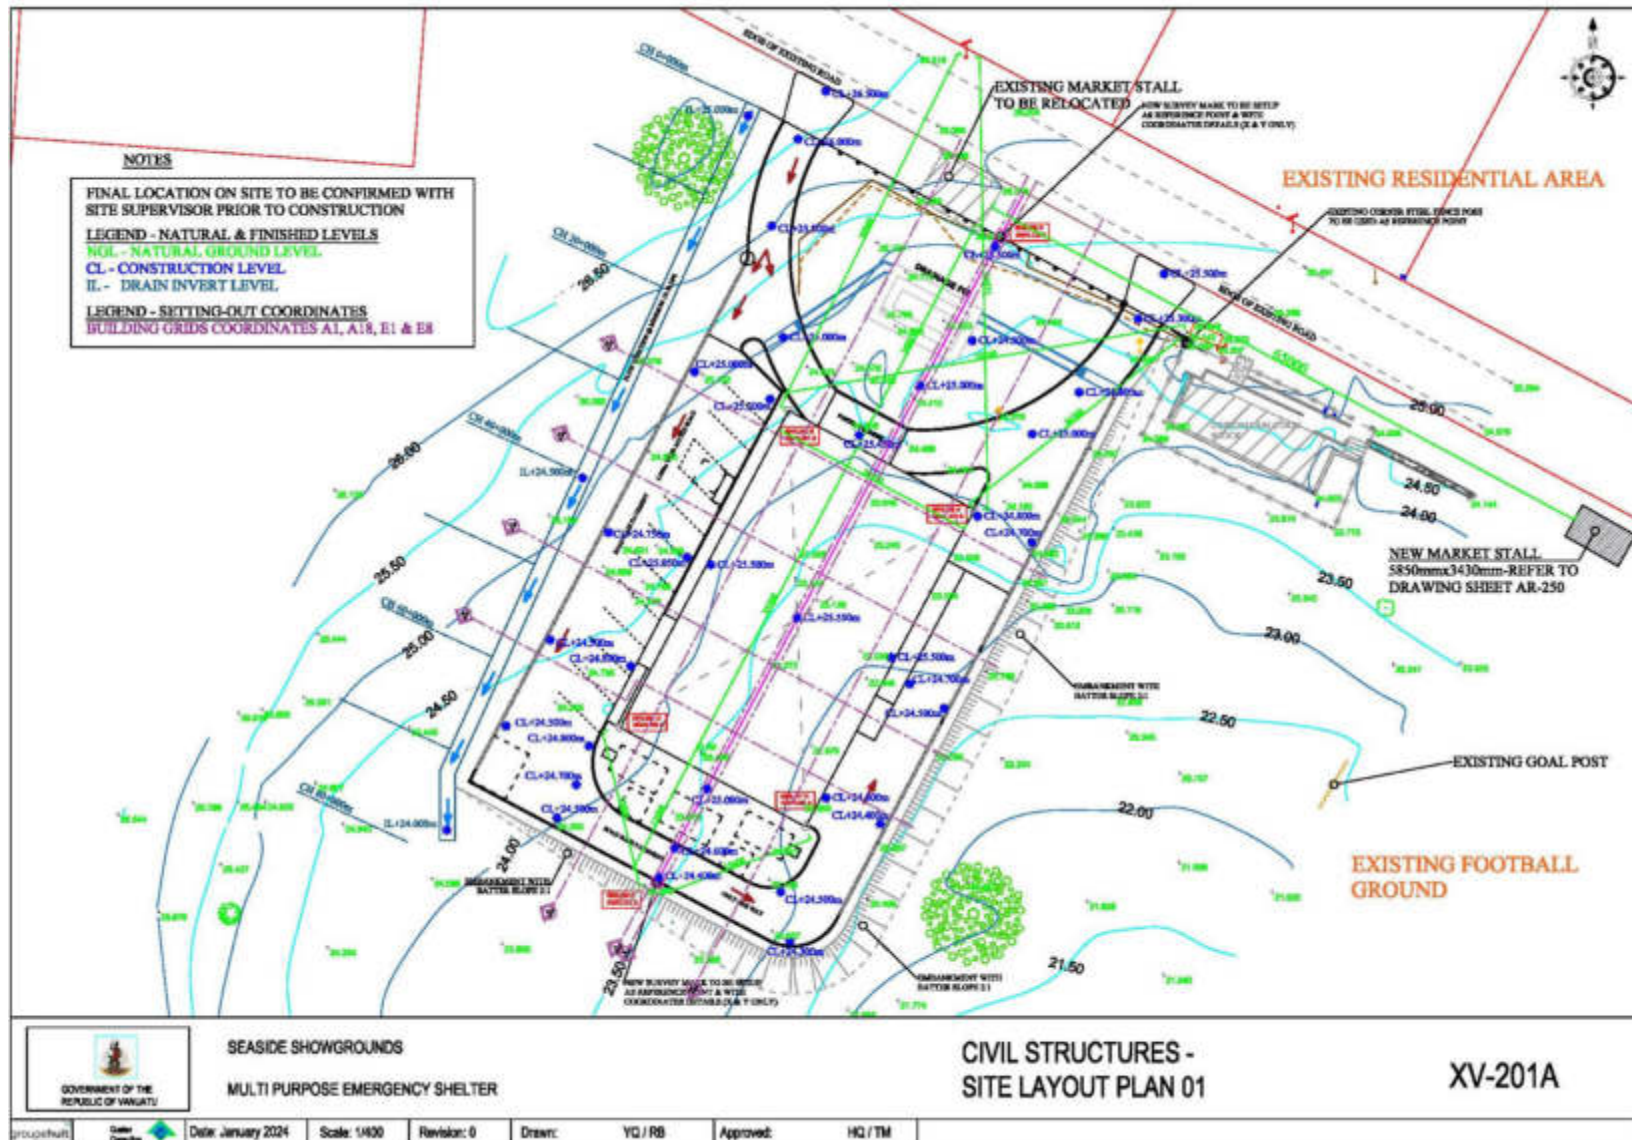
Seaside Showground - Civil structure site setout plan showing the main elevation of the construction
